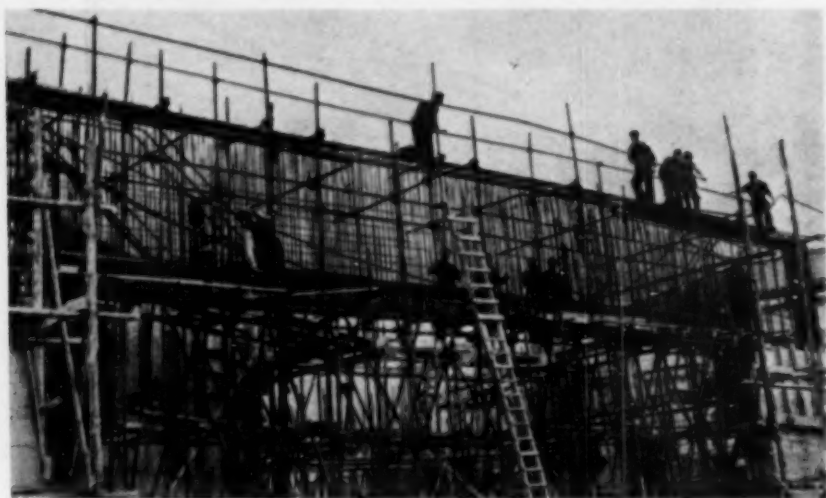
Reinforcement of Beam of Portal Frame at Omnibus Station.
